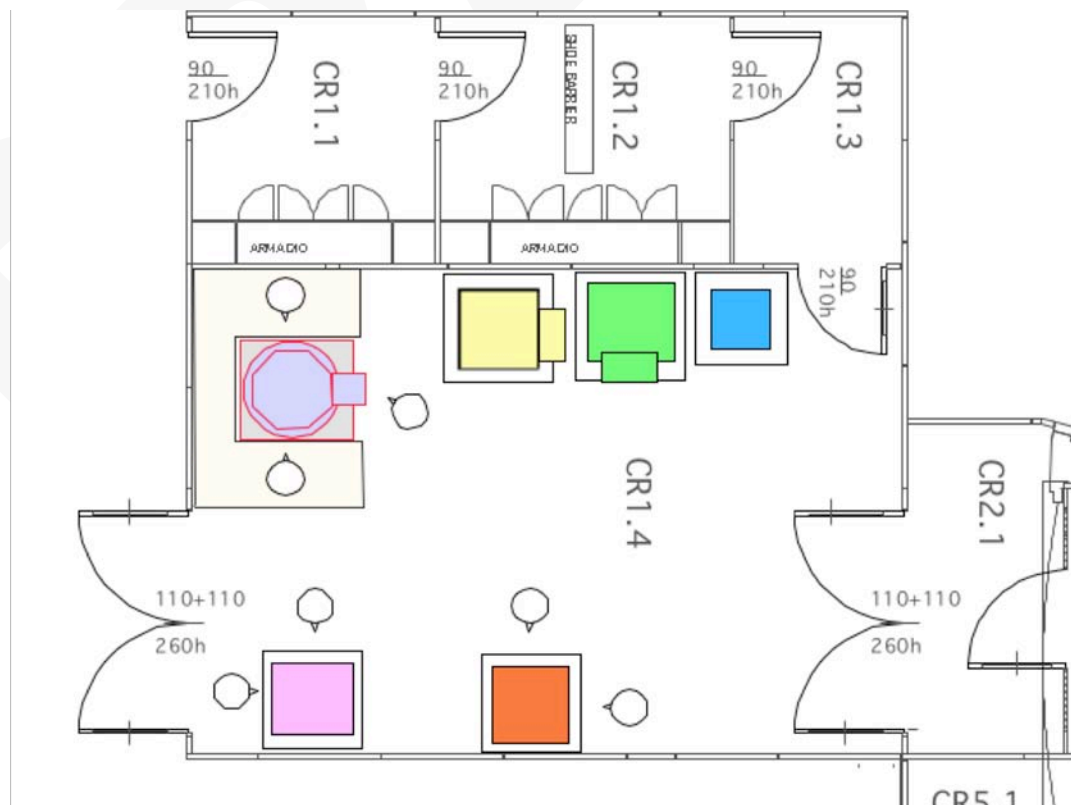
A possible arrangement of the assembly tools inside Borexino clean room
